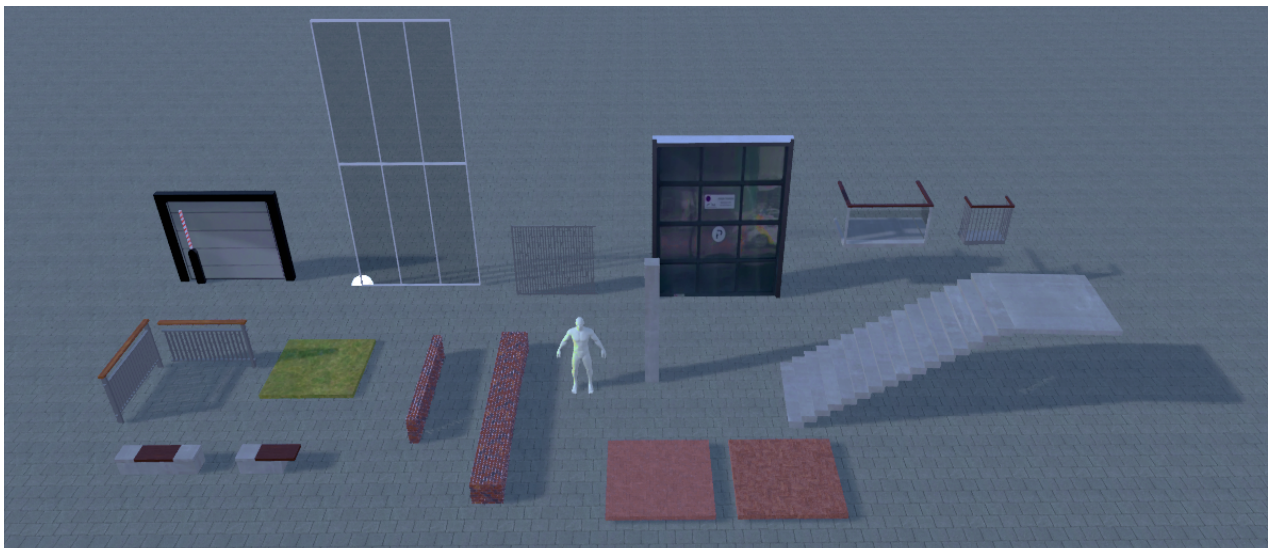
Auxiliary design elements: public space elements, roof, floor, stairs, railings, garage doors, balconies and a glass curtain wall. Human figure for scale. Own work.
